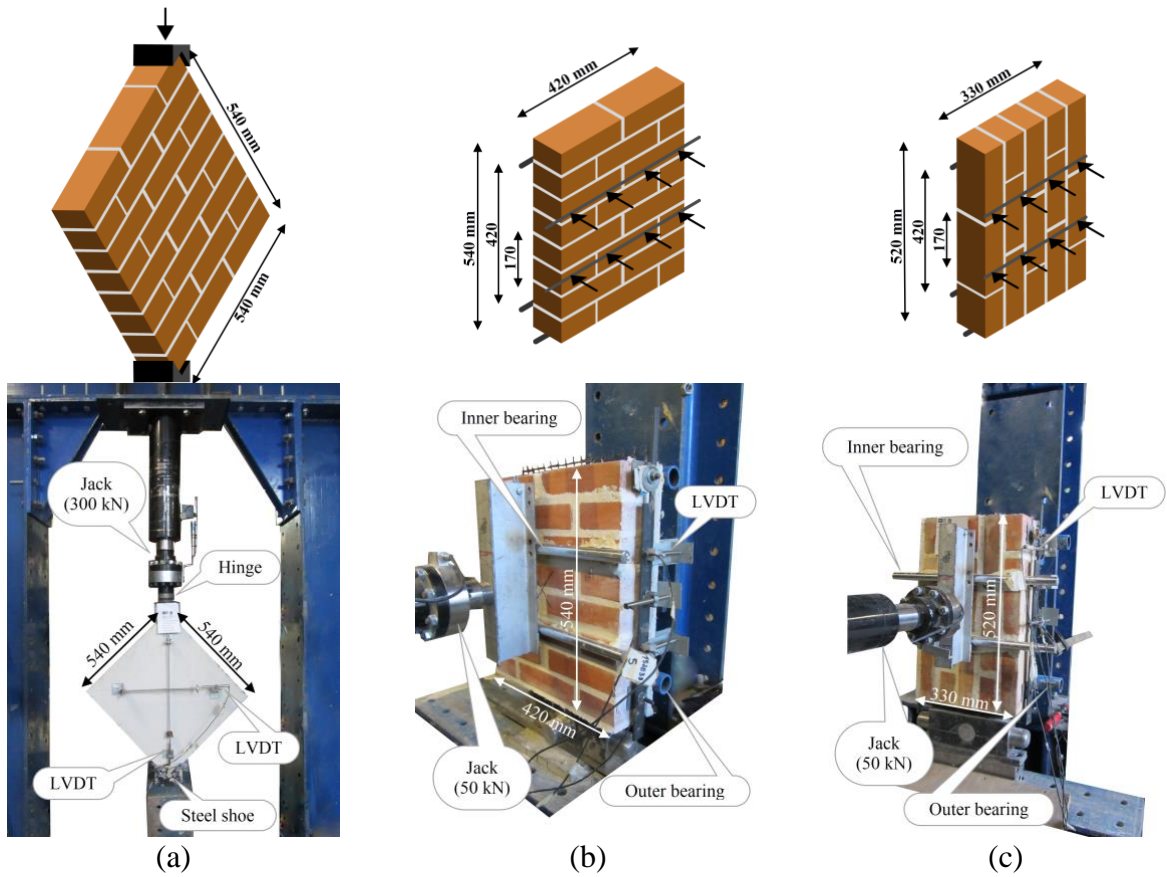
Geometric details and test setups used for testing masonry panels: (a) diagonal compression tests; (b) bending tests parallel to bed joint; (c) bending tests normal to bed joints.
